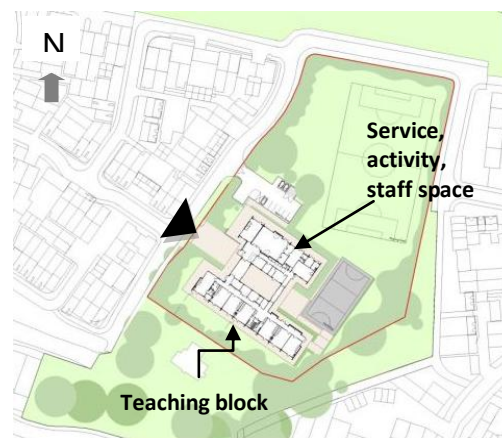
The site plan of school A with function explanations. (Source: HCC Property Services)
